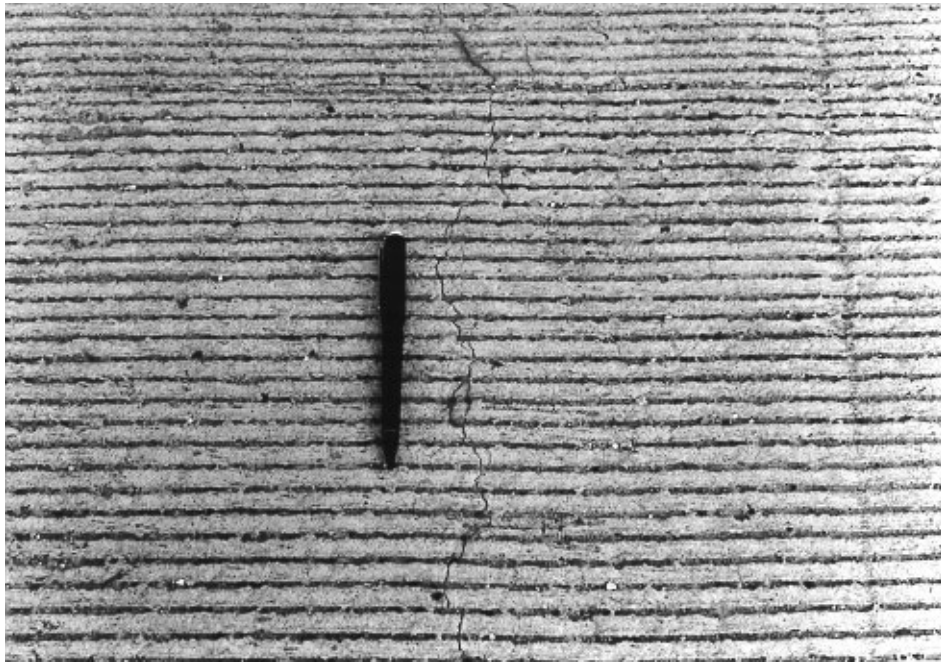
Deck Cracking – Morris and Cummings Cut Bridge (Zoomed View).
